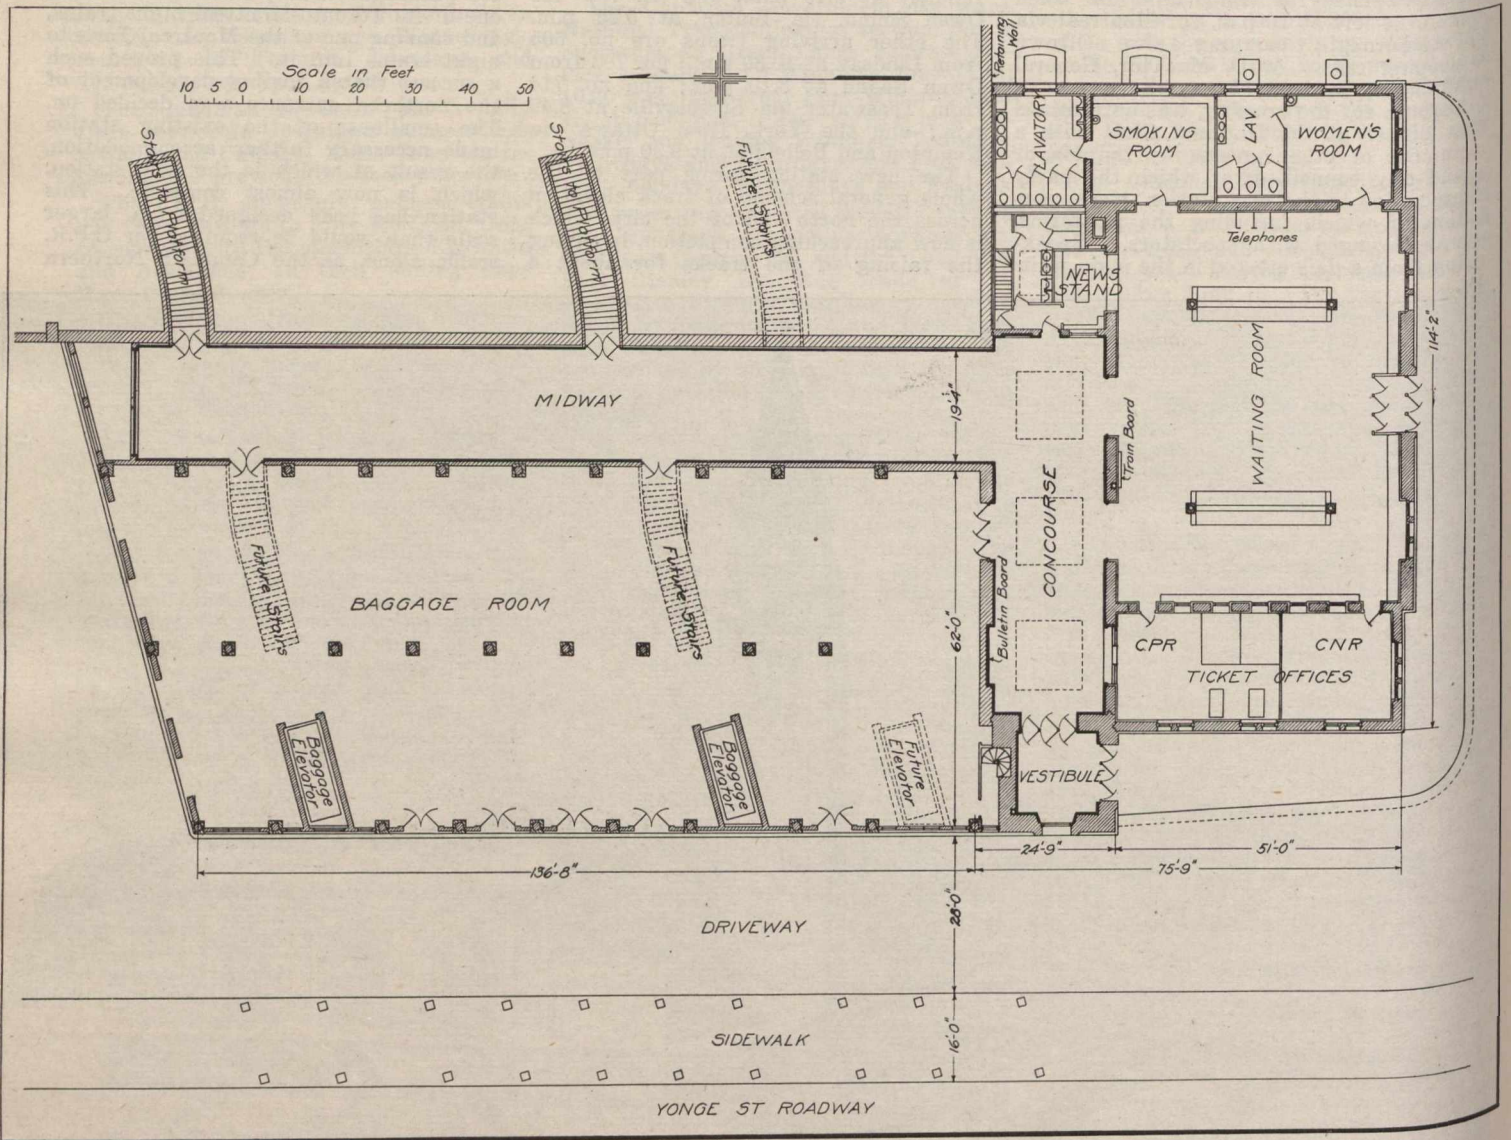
Ground Plan, North Toronto Station, Canadian Pacific Railway.
